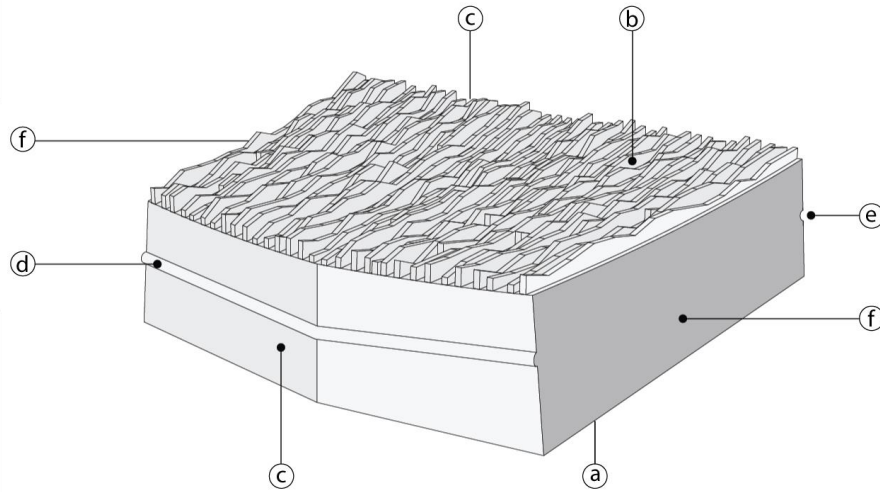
Voussoir parts: (a) extrados; (b) cutting pattern on intrados; (c) load-transferring side faces; (d) male notch ridge; (e) female notch groove; and (f) non-load-transferring side faces.
